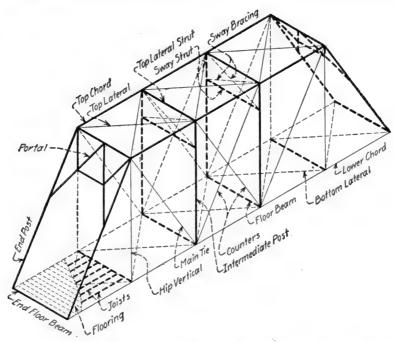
DIAGRAMMATIC SKETCH OF A THROUGH PRATT TRUSS HIGHWAY BRIDGE.
